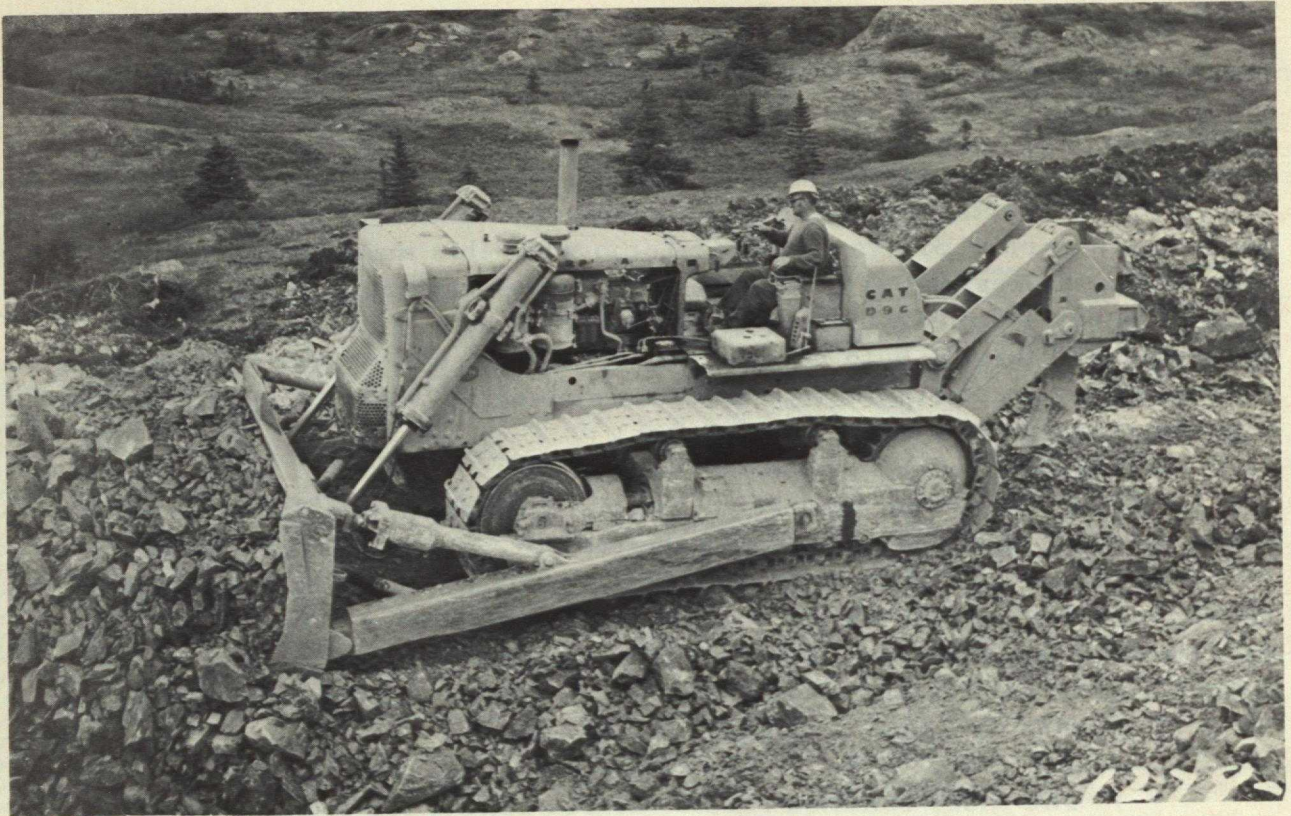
Tractor with ripper tooth. (Courtesy Crothers)
